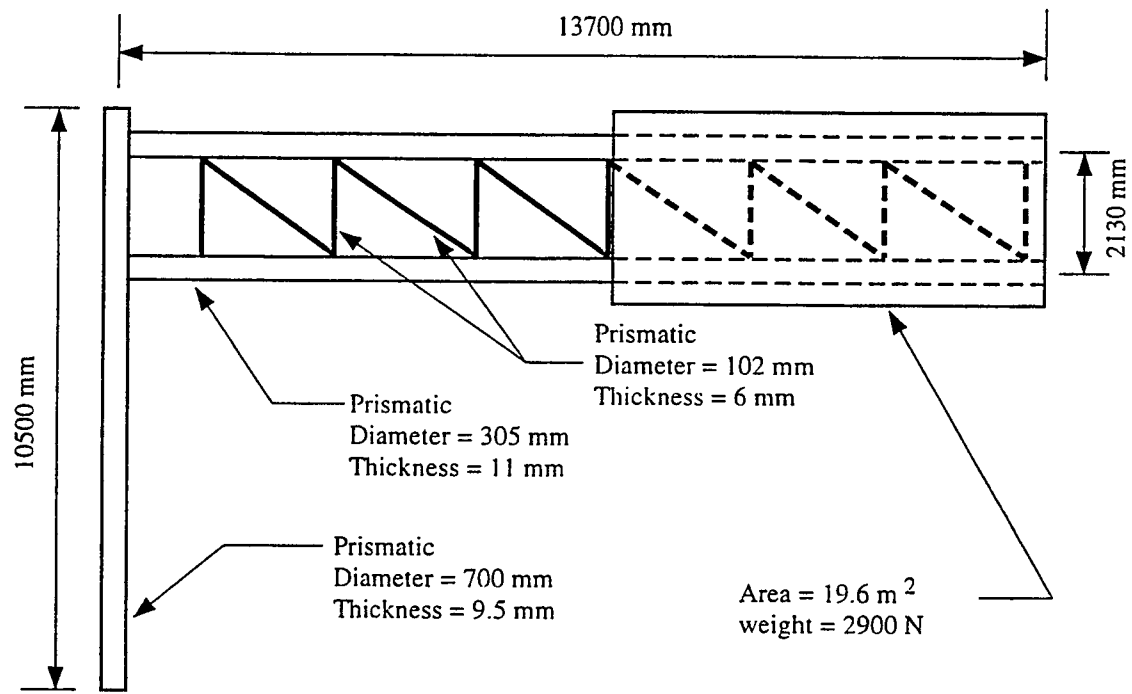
Details of Full-Scale Cantilevered Sign Support Structure (Sign Support #1)
